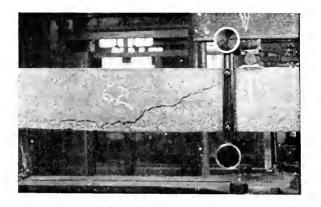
VIEWS SHOWING BEAMS AFTER FAILURE.
